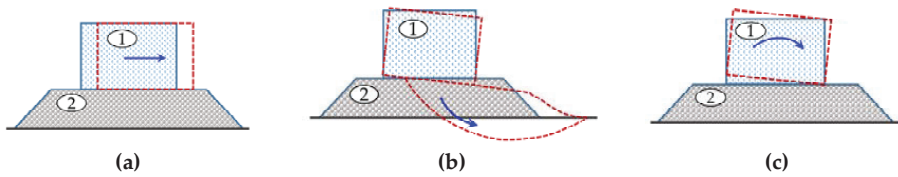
Overall failure mode of breakwaters (BRWs) studied: (a) Sliding, (b) Insufficient foundation bearing capacity, (c) Overturning.
